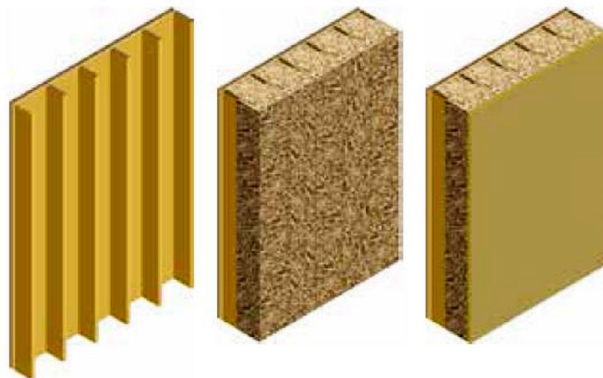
Straw-bale wall studied, prefabricated in Wallonia
